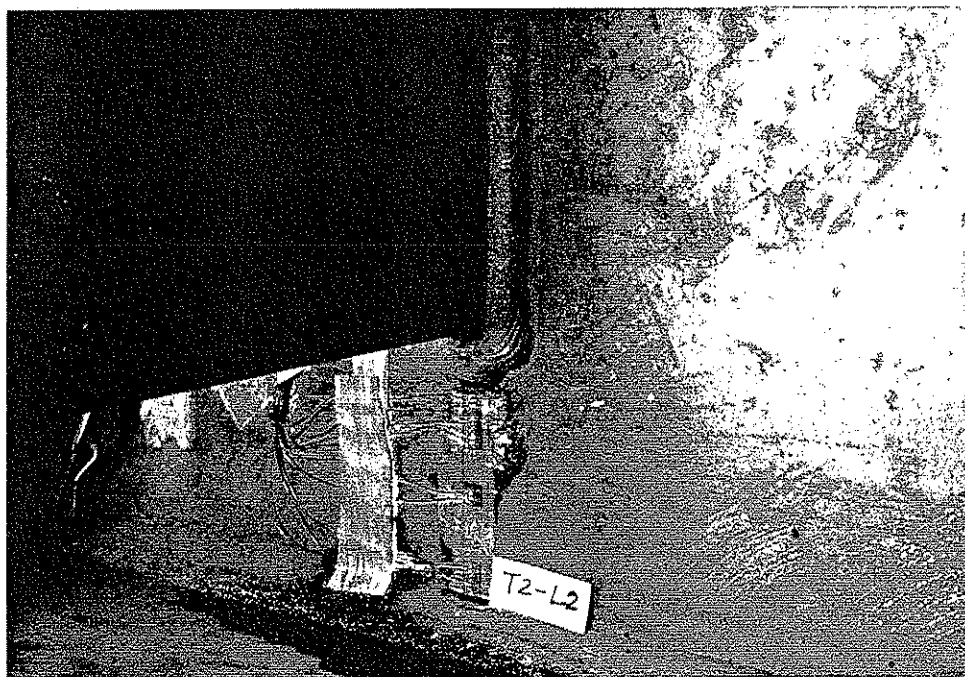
Closeup view of crack at end of transverse connection plate welds (3 in. detail)
